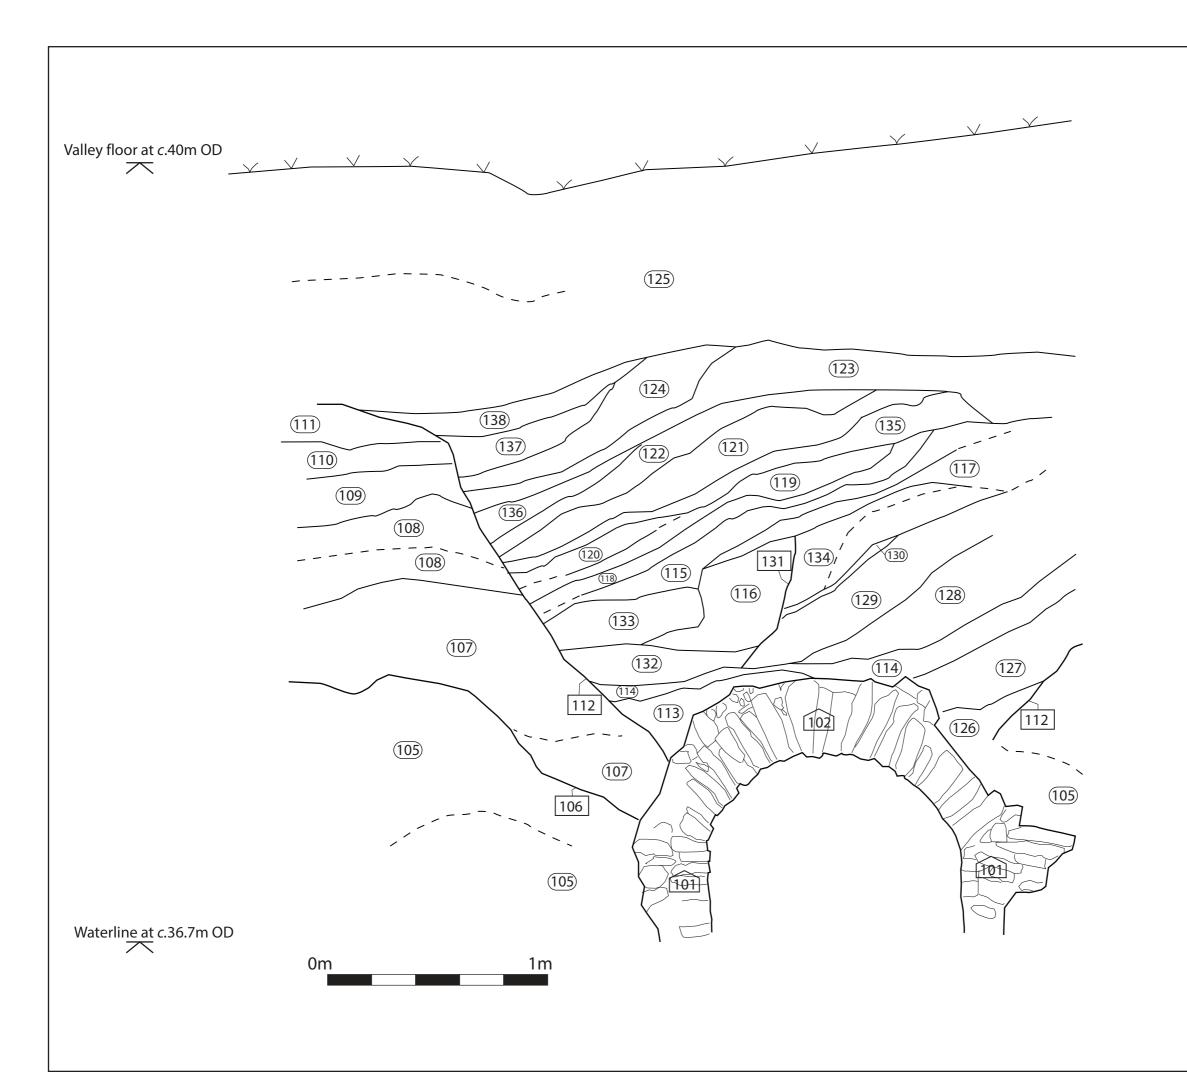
North facing section of deposits revealed overlying the culvert in the area of collapse at Raby's Furnace, Llanelli.
